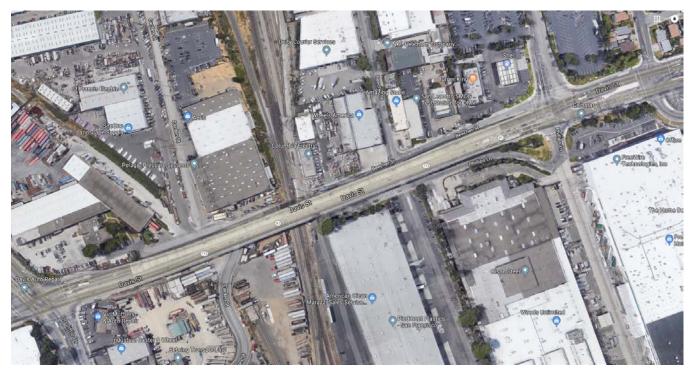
Aerial Photo of the Roadway Overhead Structure over UPRR
